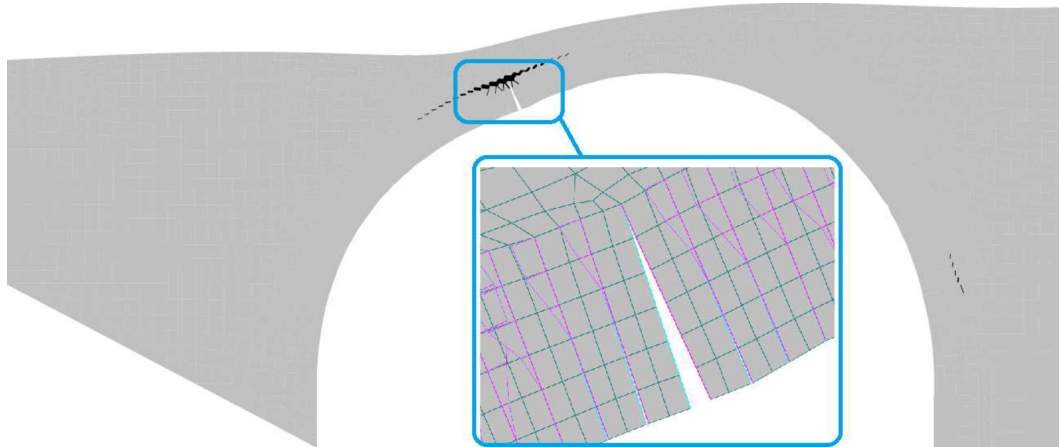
Deformed shape (Scale 1:50) and crack pattern under the load of 0.291 MN
